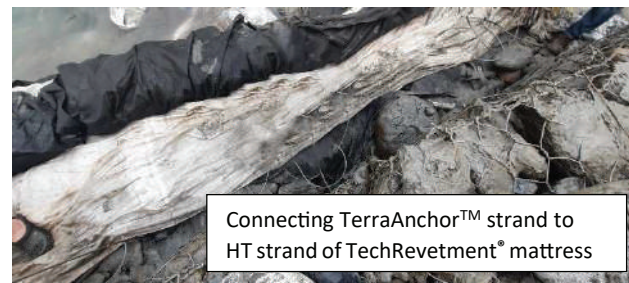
Connecting TerraAnchor™ strand to HT strand of TechRevetment® mattress
